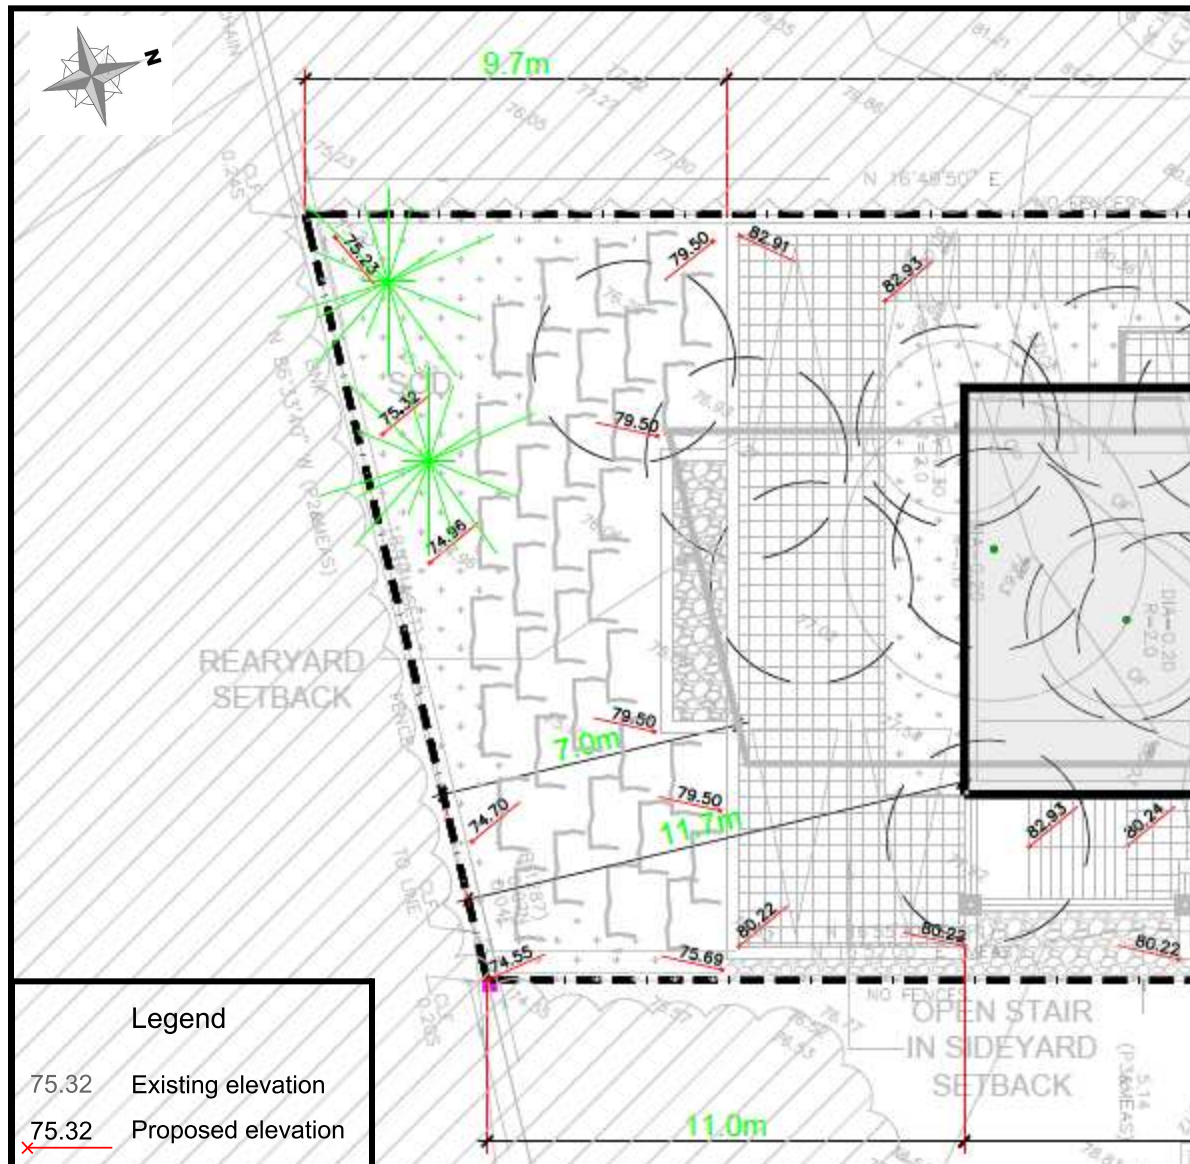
Proposed Grading Plan for 2458 Cleroux Cres.
